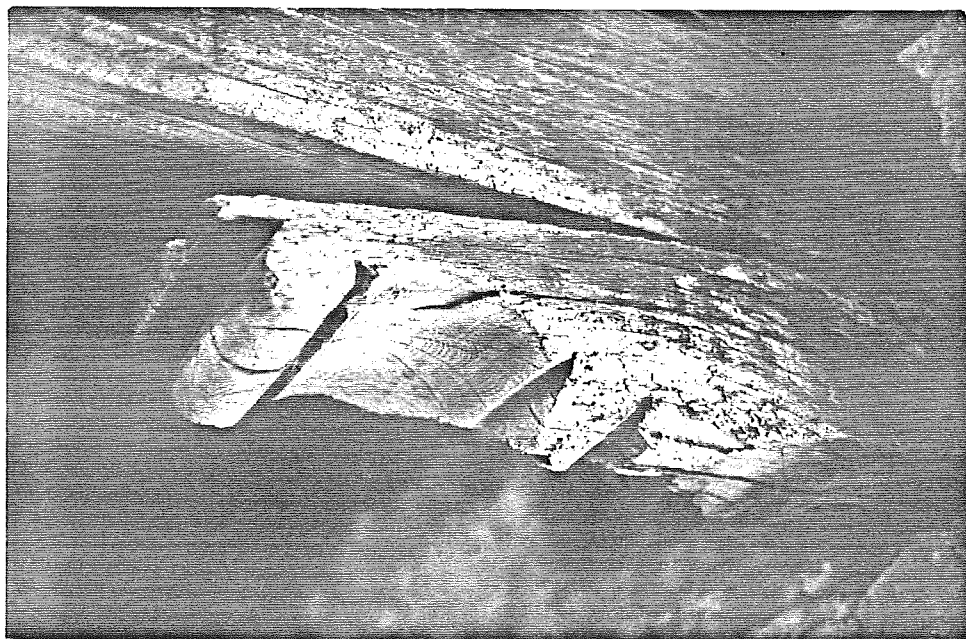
Carved wooden corbel imbedded in east wall to support roof timber of truss construction (Appendix C, BUILDING PLAN, No. 14).
